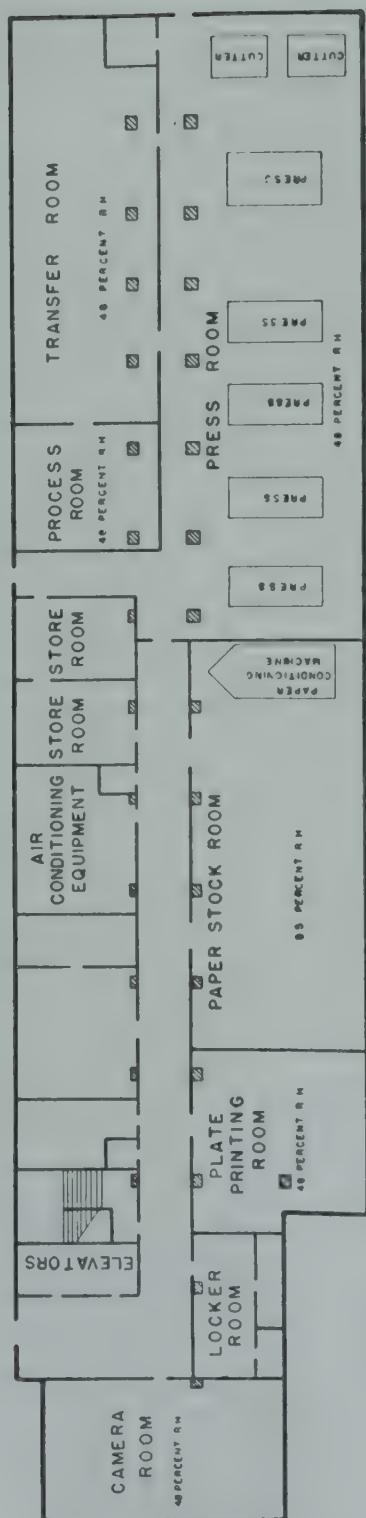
Plan of an Air Conditioned Lithographic Plant with Single Dew-Point Control System.
